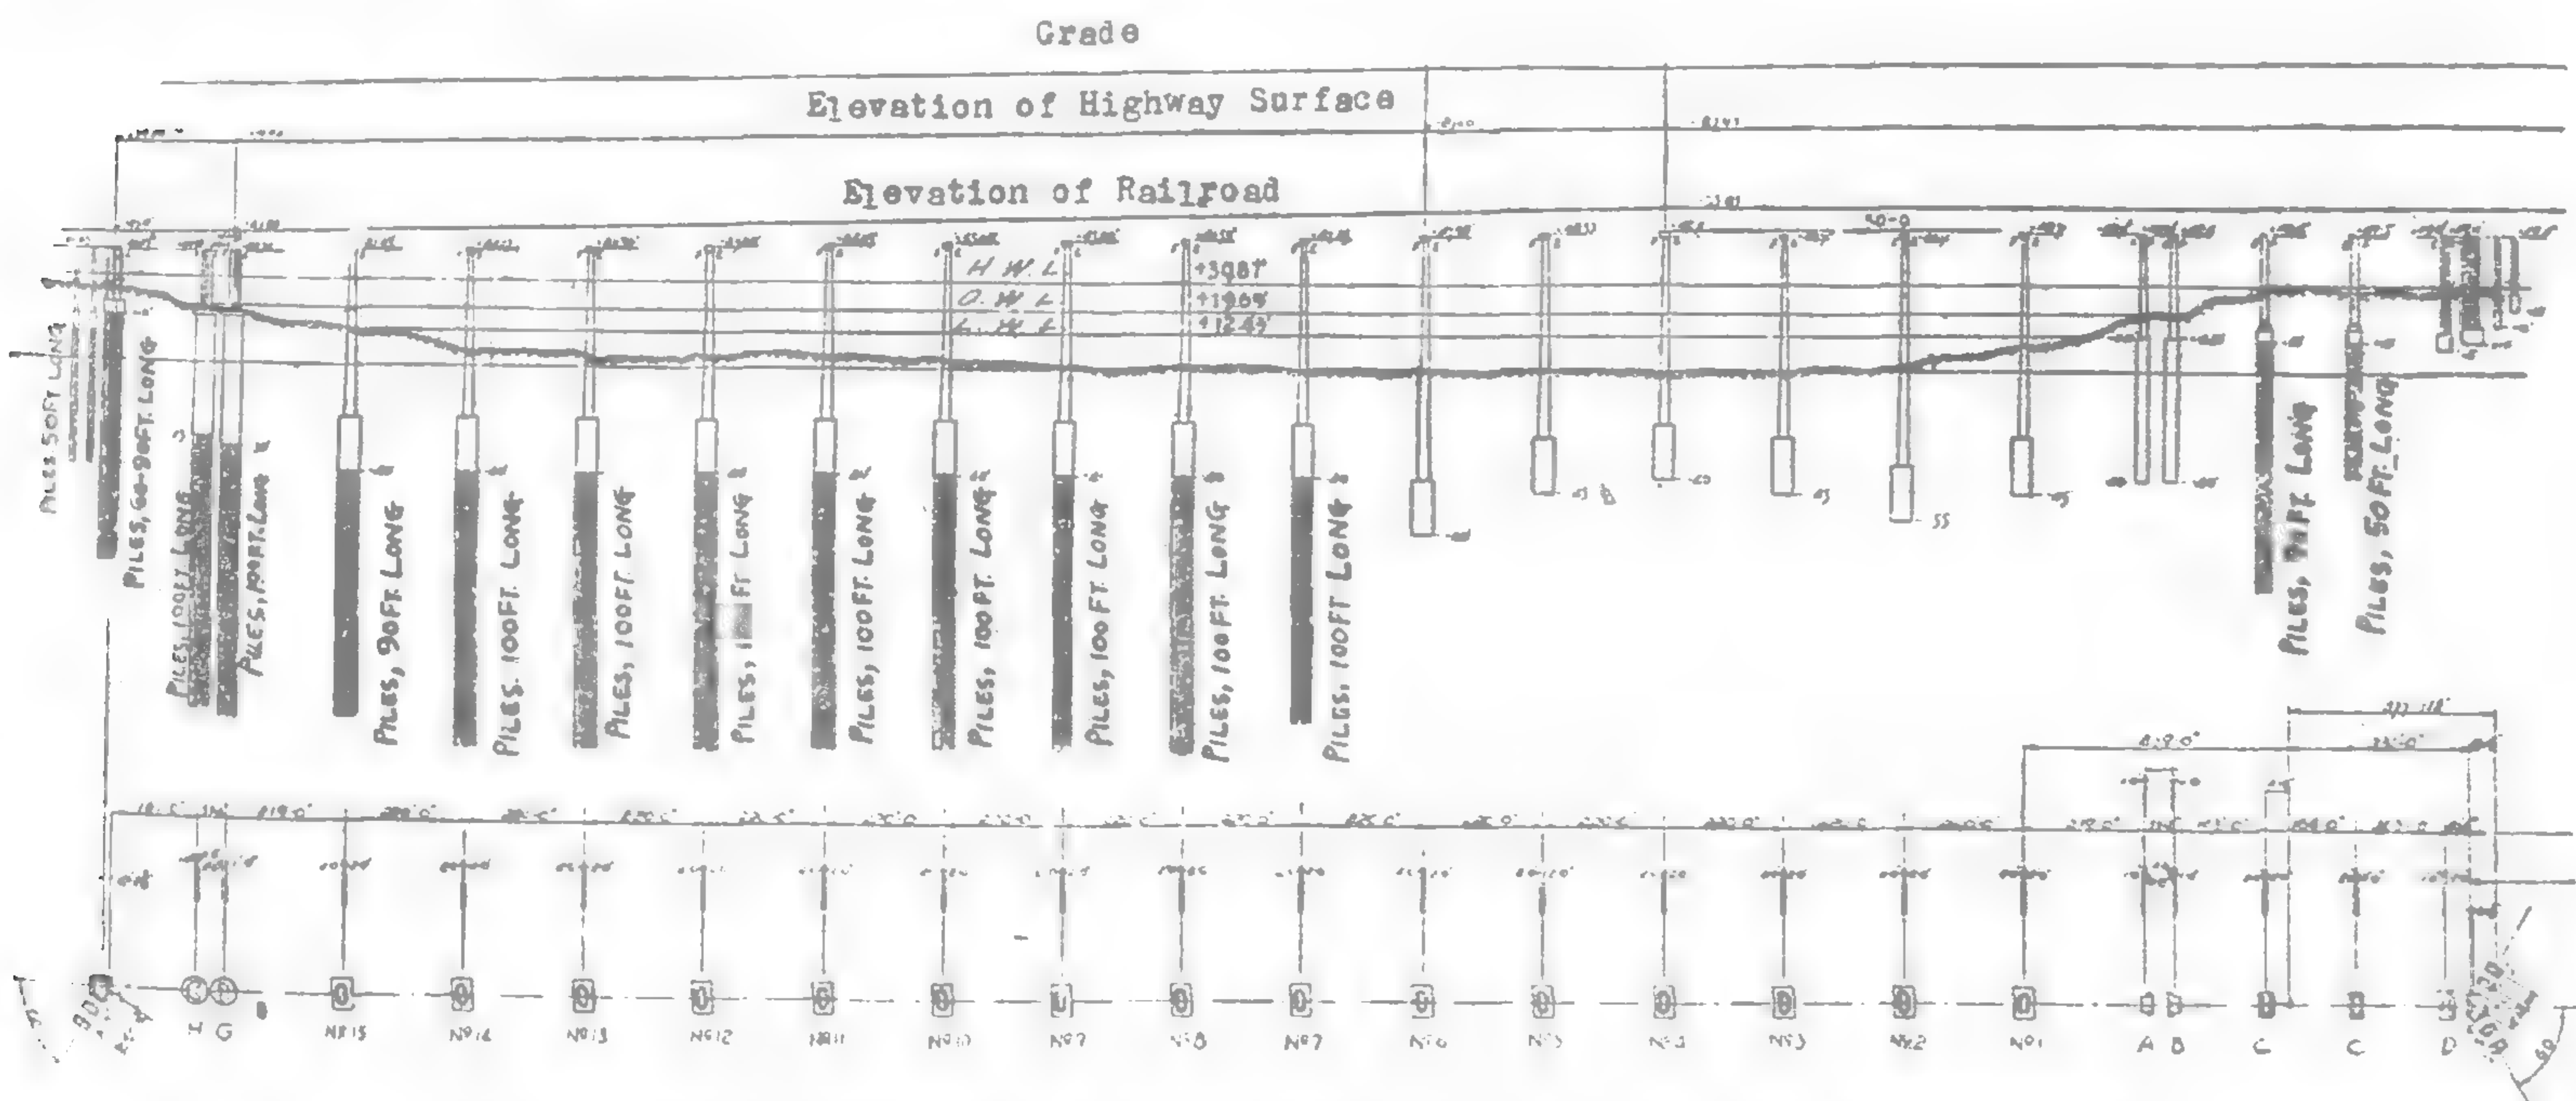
General arrangement of the foundation work of the Chien Tang River Bridge
